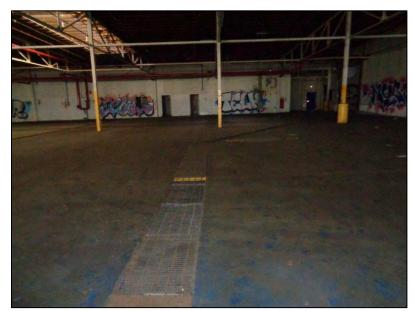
Star-Kist Plant No. 4, interior, warehouse/manufacturing area showing drains in floor, camera facing east. ICF, 2018.
